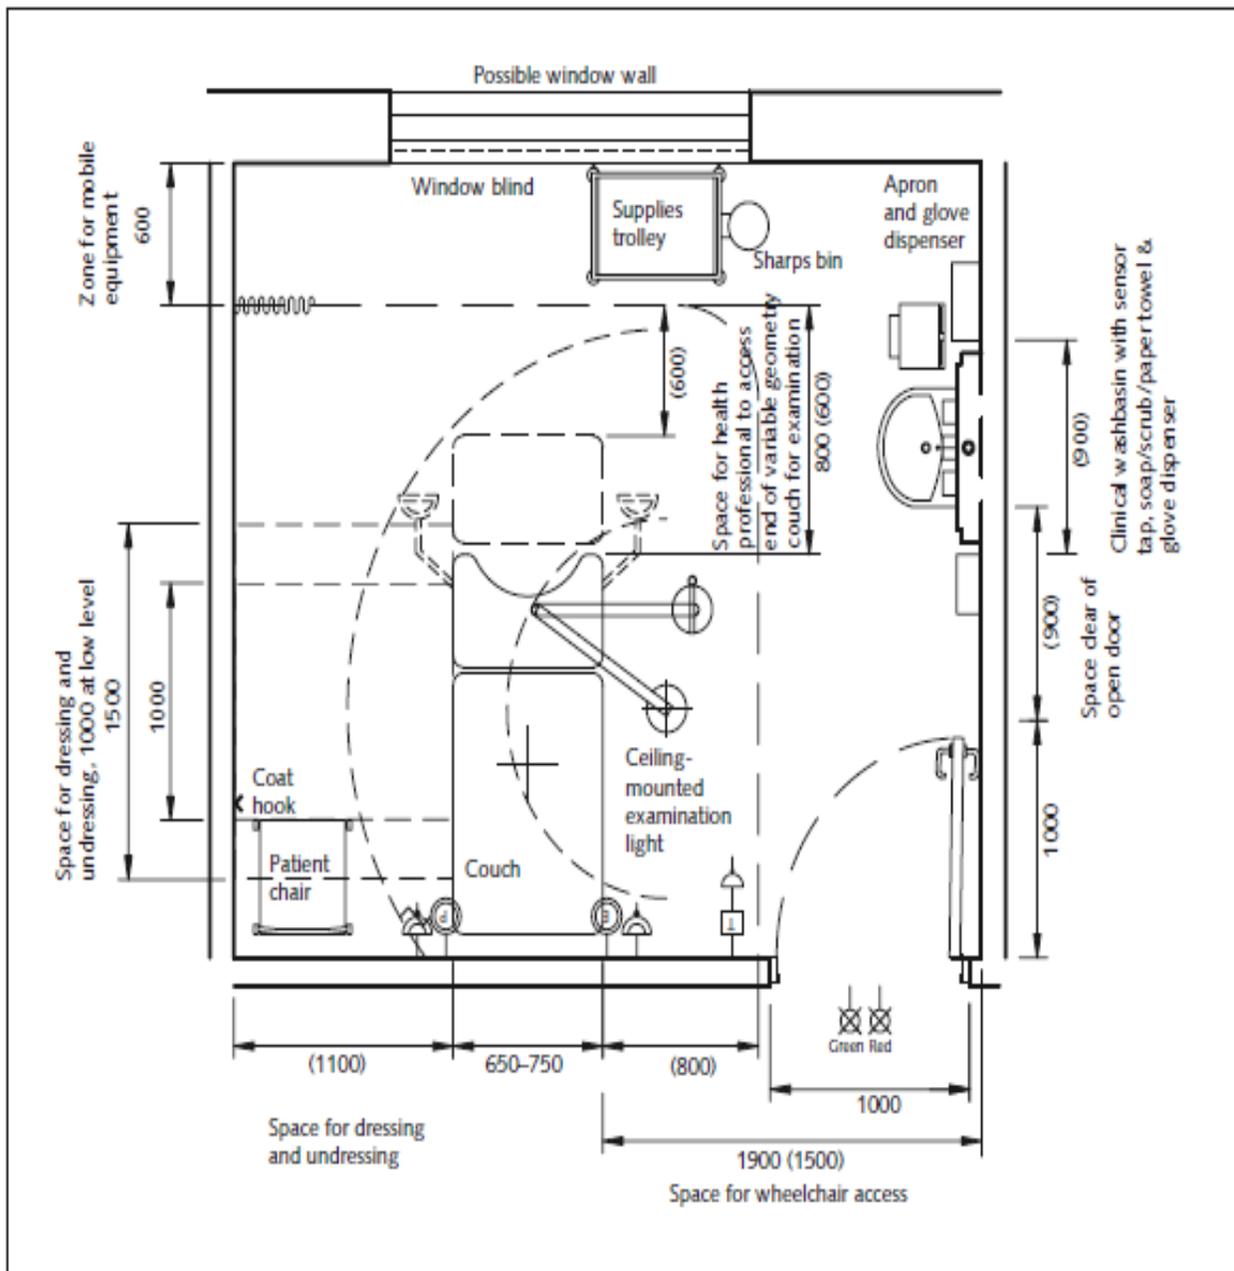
Double-sided couch access, single door (Consulting & examination room) (Consulting & examination room)
